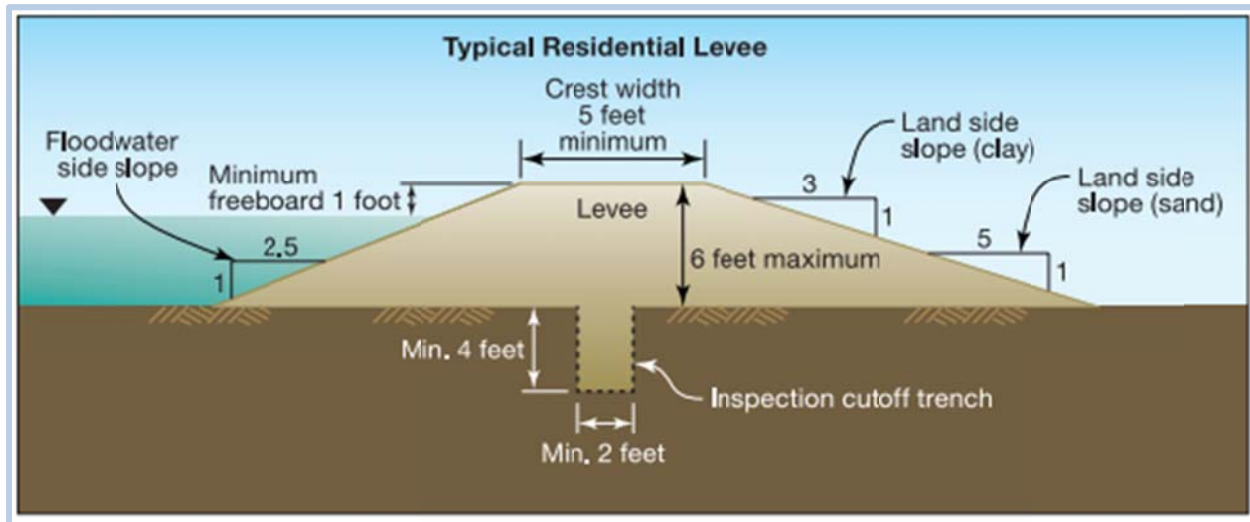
Typical Earthen Levee Cross Section (ref. FEMA)
